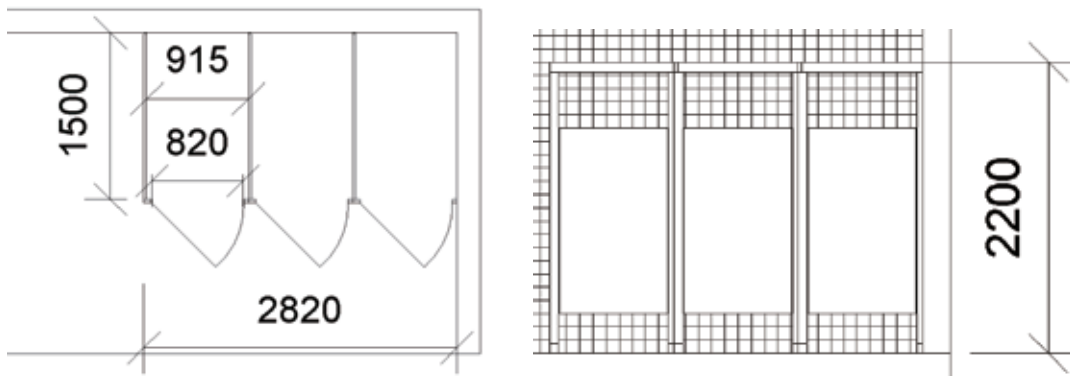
Plan and Elevation View of Toilet and Shower Cubicles
